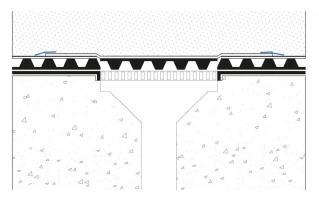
Cut section of Deckdrain to width of drain and place upside down over the drain cover. Overlap with geotextile and fix in place using jointing tape
